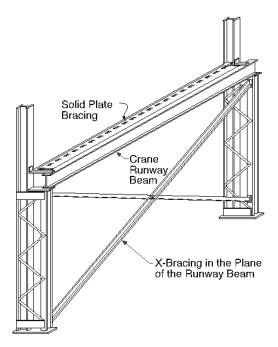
Vertical Bracing for Heavy Cranes
